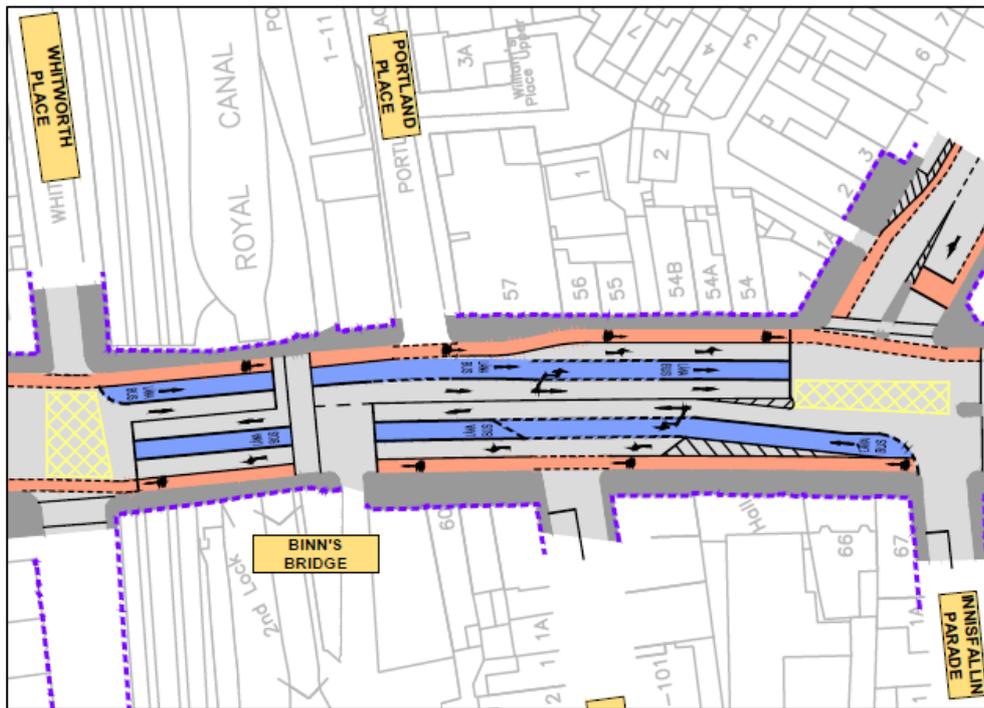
Whitworth Road/Whitworth Place to Belvedere Road/Innisfallen Parade
